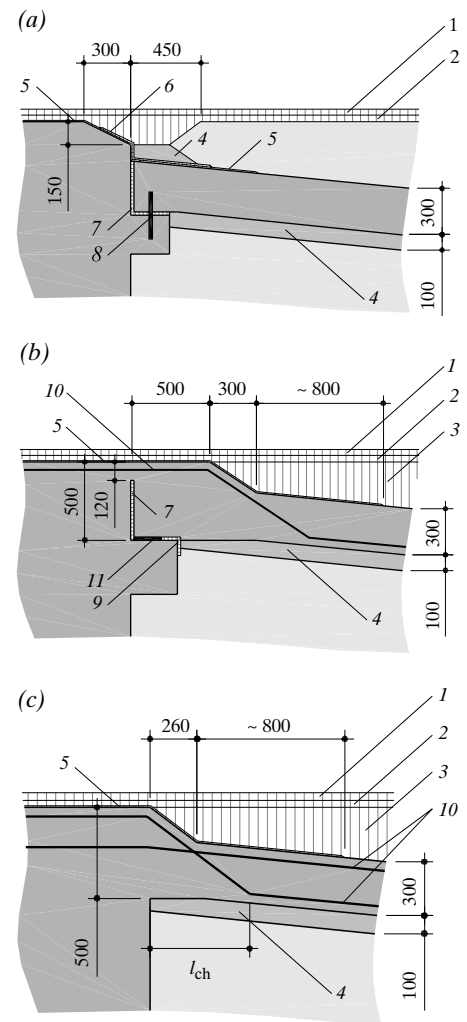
Details of connection between abutment and transition slab, units in mm; (a) detail for standard abutment with joints according to the Graubünden/CH Department of Civil Engineering²¹; (b) detail for integral abutment according to Swiss recommendations⁵; (c) new improved detail for standard and integral abutments. 1: surface layer; 2: support layer; 3: additional support layer; 4: mass concrete; 5: first water sealing layer; 6: second water sealing layer; 7: bituminous layer; 8: steel stud; 9: synthetic foam; 10: connection reinforcement (other reinforcement not shown); 11: sliding bituminous layer
